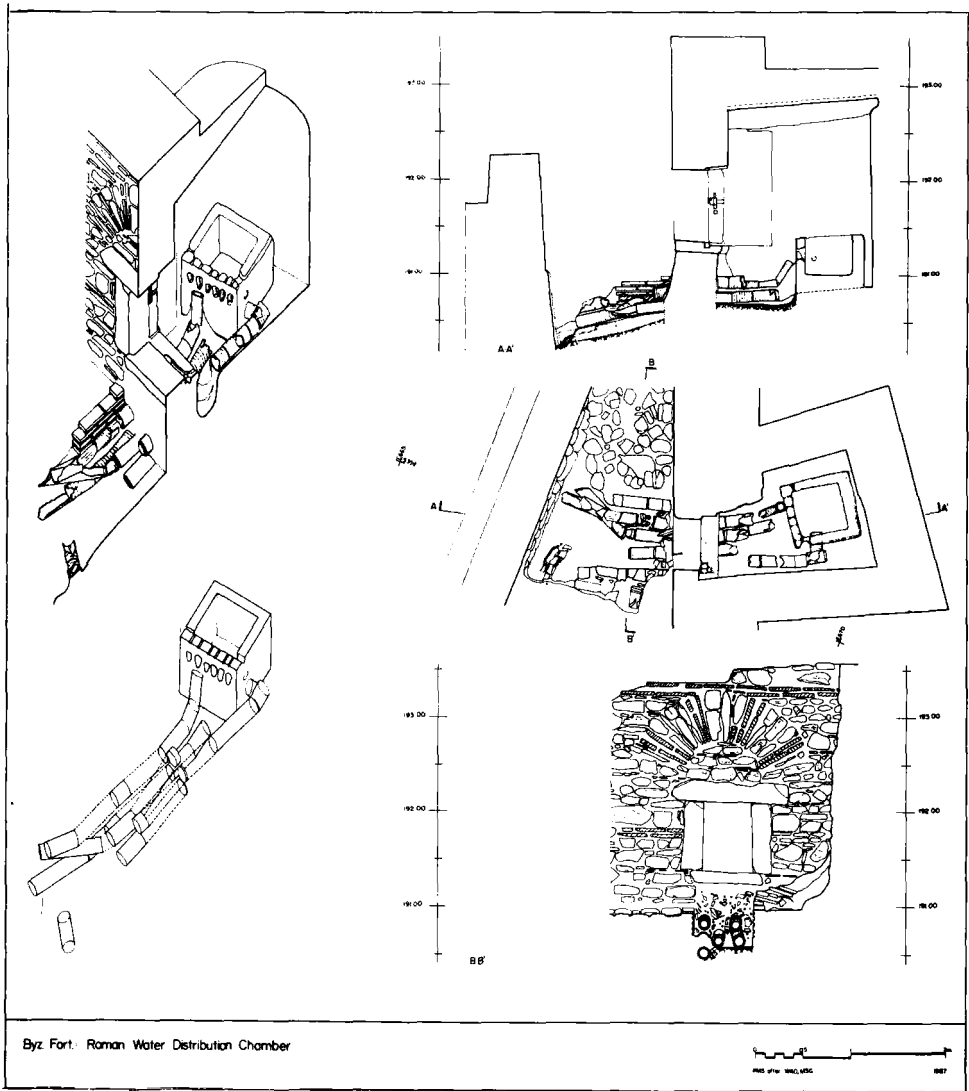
Roman water distribution chamber section, plan elevation, and isometric views
